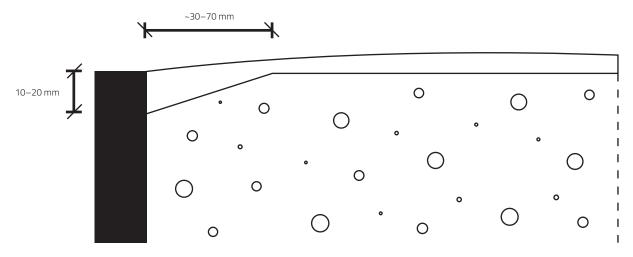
Joining a mass layer to steel structures that are flush with the floor level.
